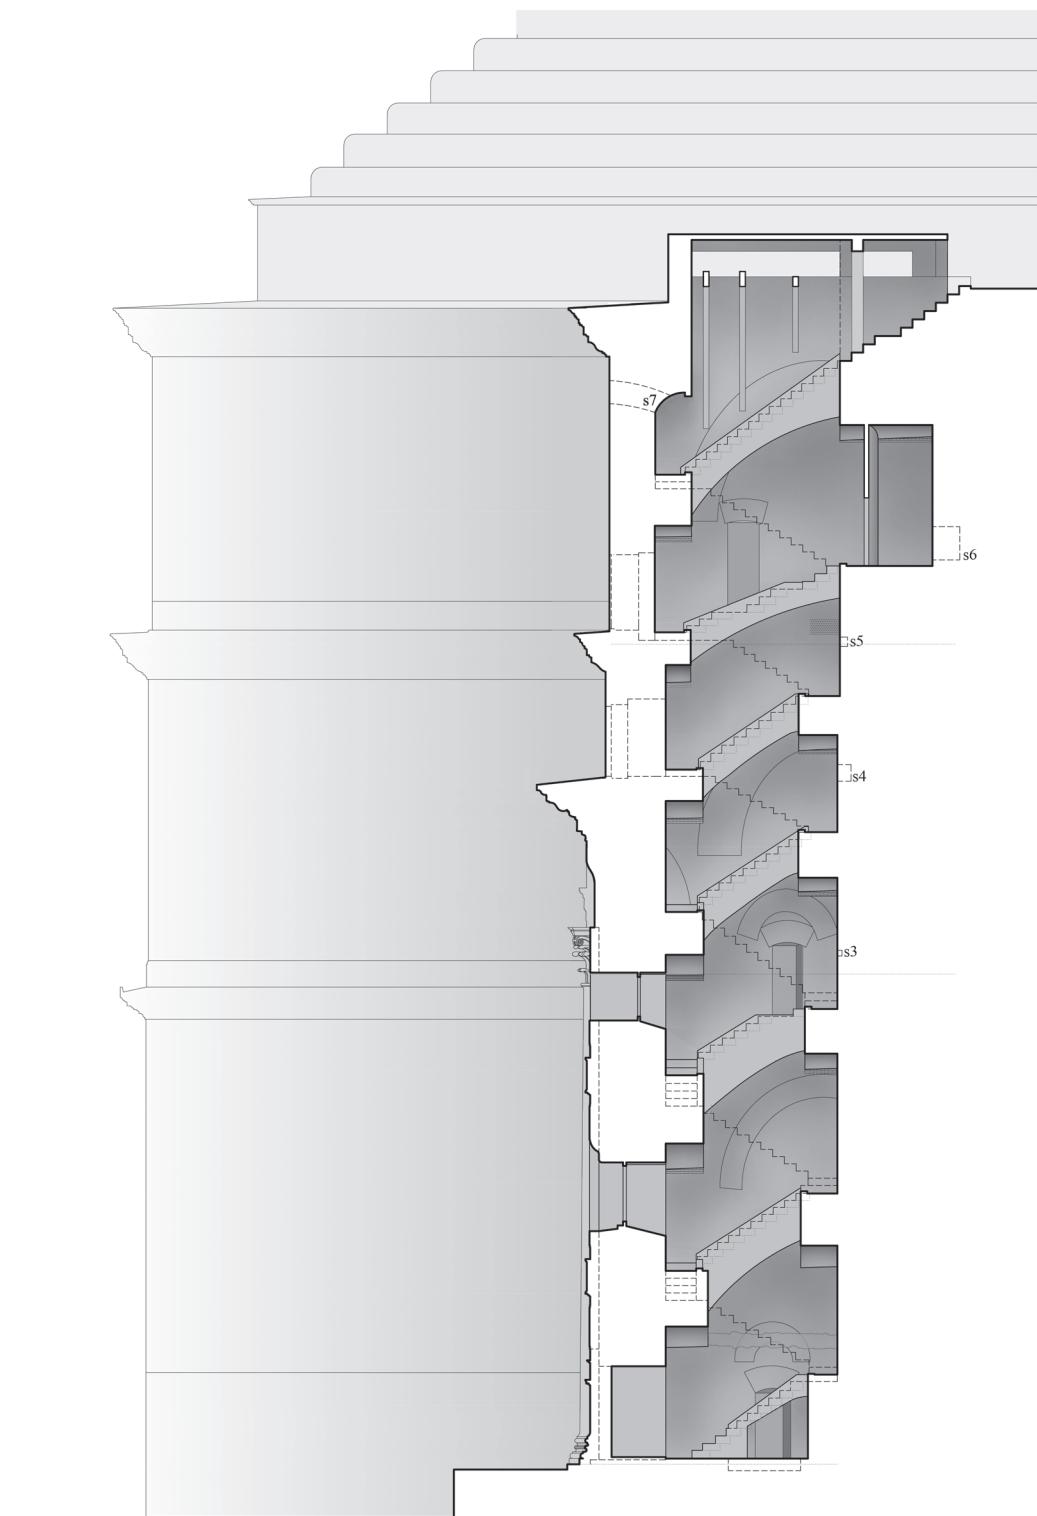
Section of the East Stair, 1 : 200 (author, Roberta Zaccara and Robert Grover).
